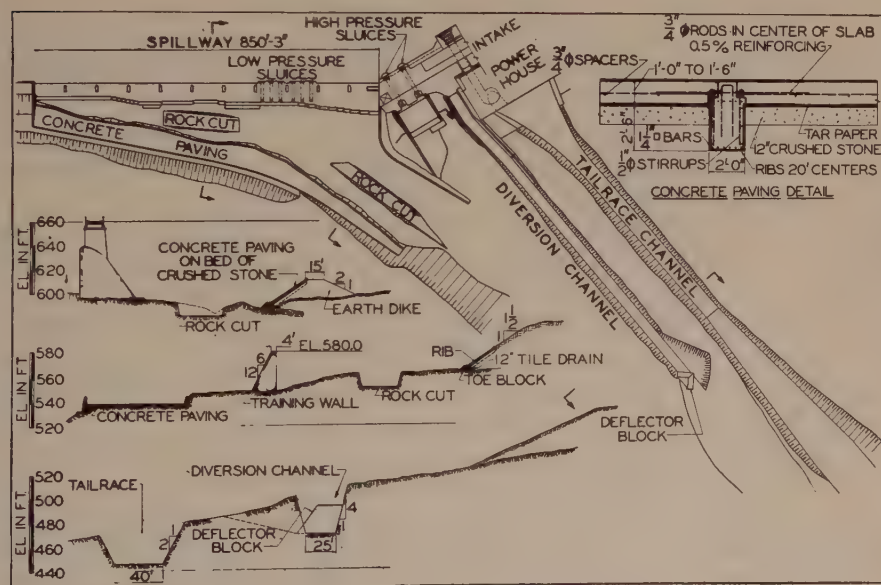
SPILLWAY CHANNEL AND EMBANKMENT PAVING
